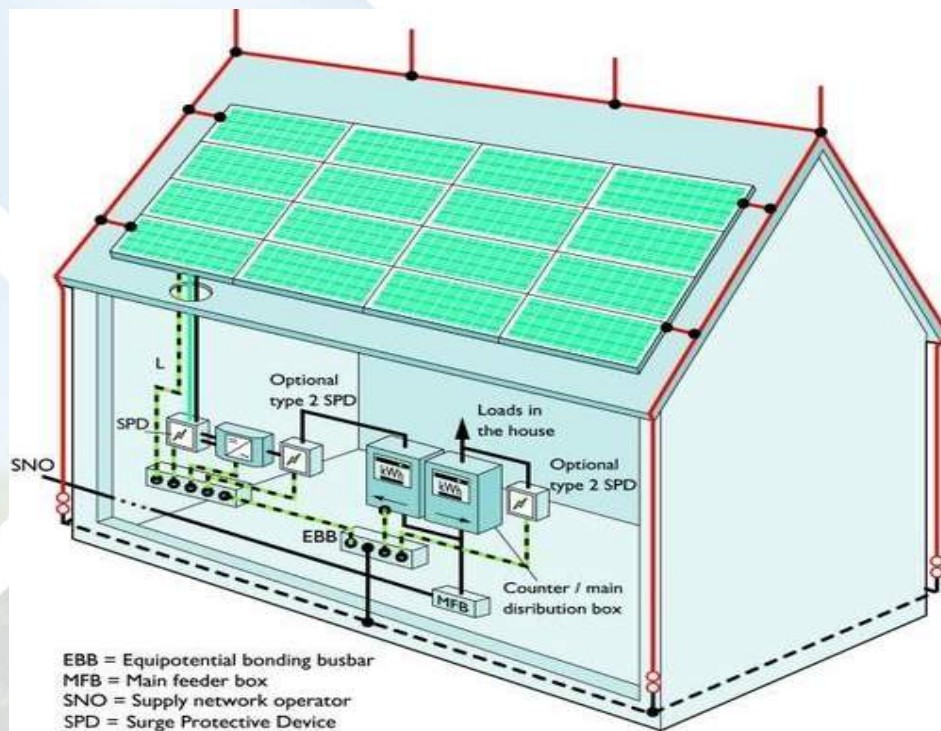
Photovoltaic installation on the building with the lightning installation, where:
